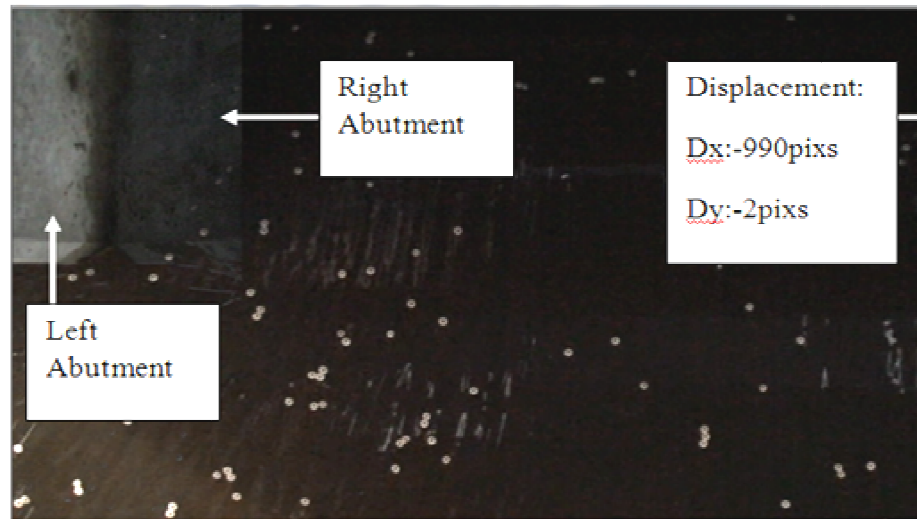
Overlapping north and south images with the abutments aligned face to face
